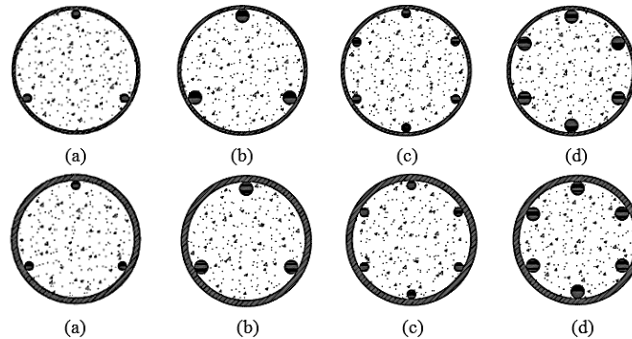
Layouts of reinforcing bars with 3.15 and 5.63 mm wall thickness: (a) 3-Ø 8; (b) 3-Ø 12; (c) 6-Ø 8; and (d) 6-Ø 12
